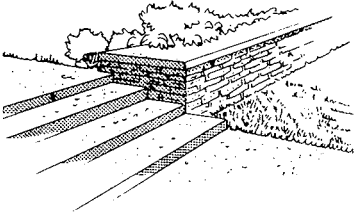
Save a bank mowing problem by building an attractive retaining wall. Steps are for handy access.
